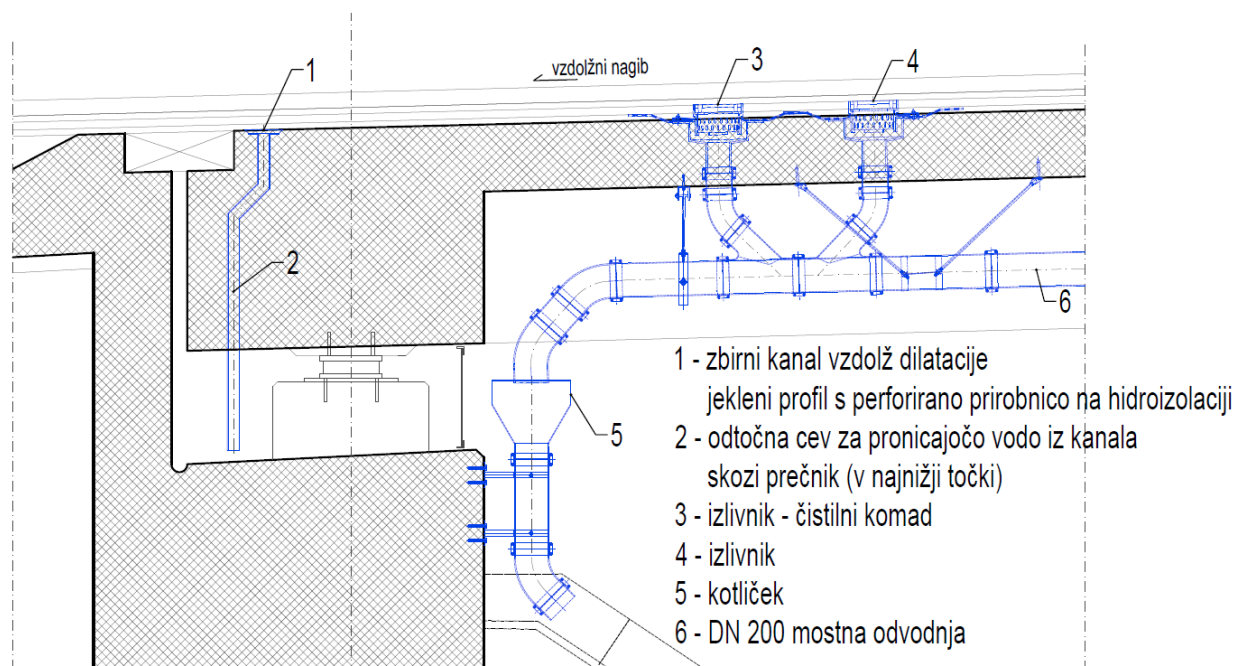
Drainage of the CPV prior to expansion joint, with water collected in the longitudinal bridge drainage system
